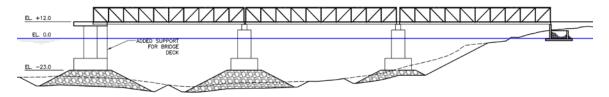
Plan, Approach 2 for Steensby Island Ore Trestle (see Appendix A)
